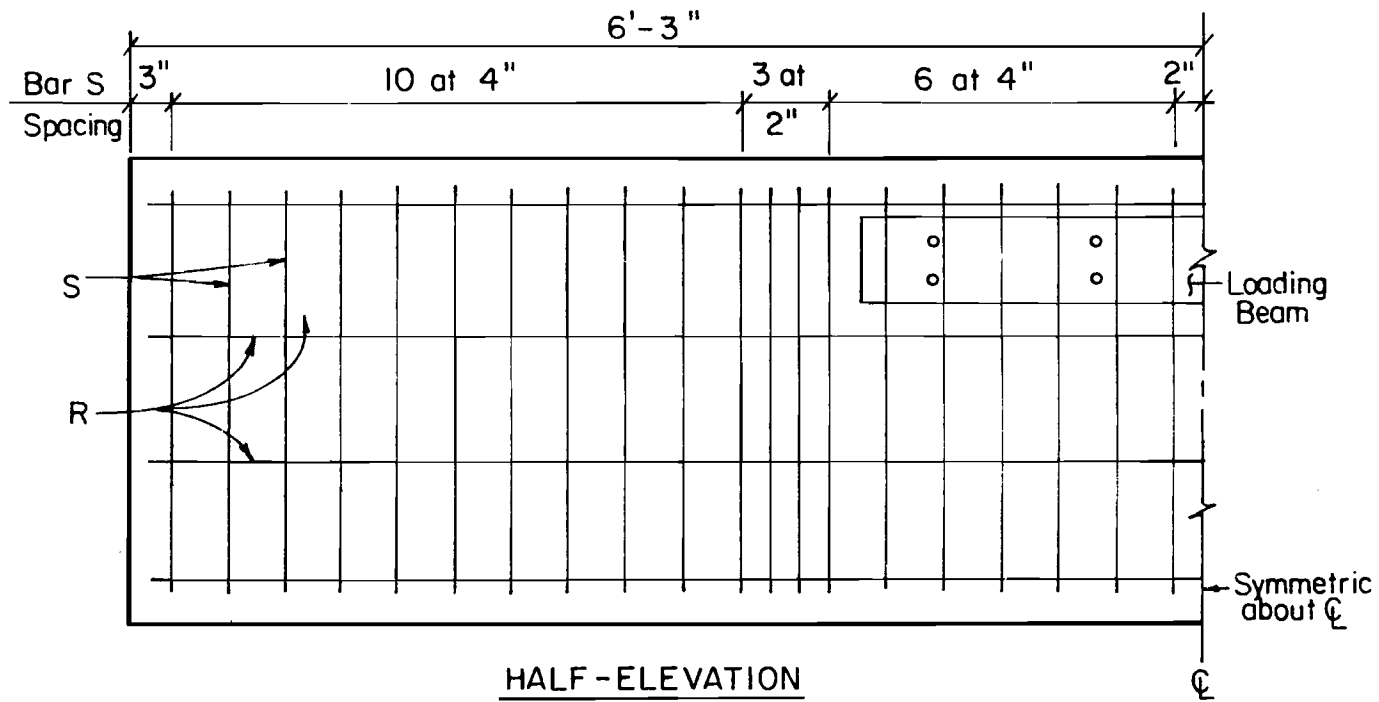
Spacing of transverse reinforcement in cast-in-place barrier
